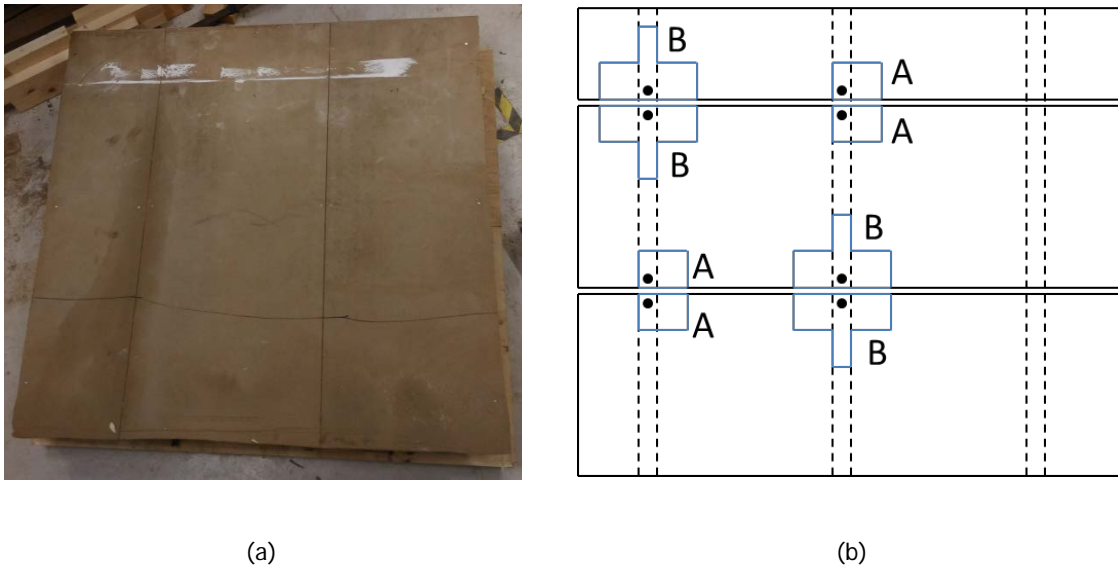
(a) Floor sample Z1, Zijlvest 25, Loppersum, (b) extracted test specimens.
